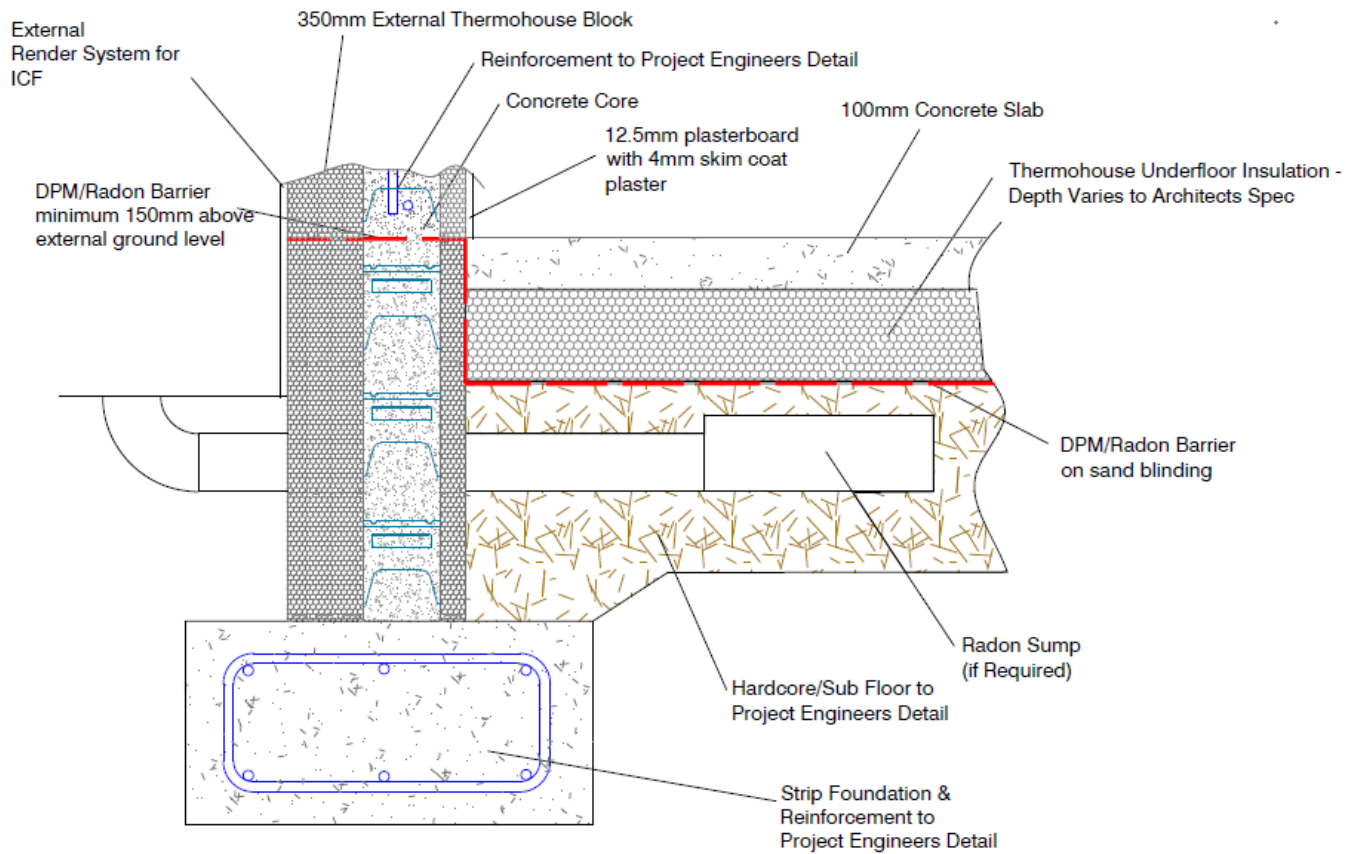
Strip Foundation with 350mm ICF External Wall and Concrete Slab on Insulation
